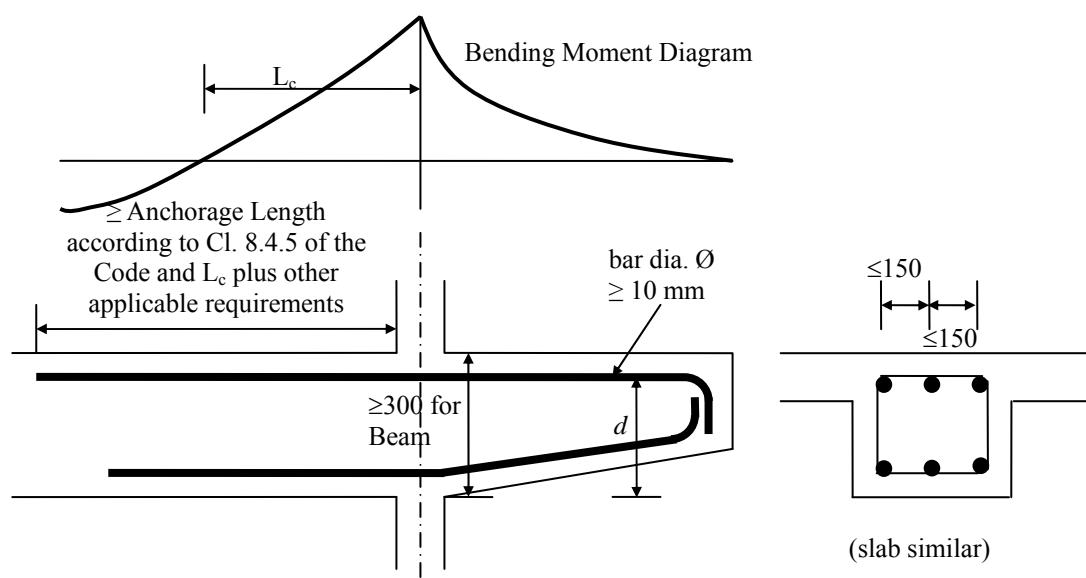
Detailing Requirements of Cantilever Projecting Structure Supported on Members Not Providing Rotational Restraint
